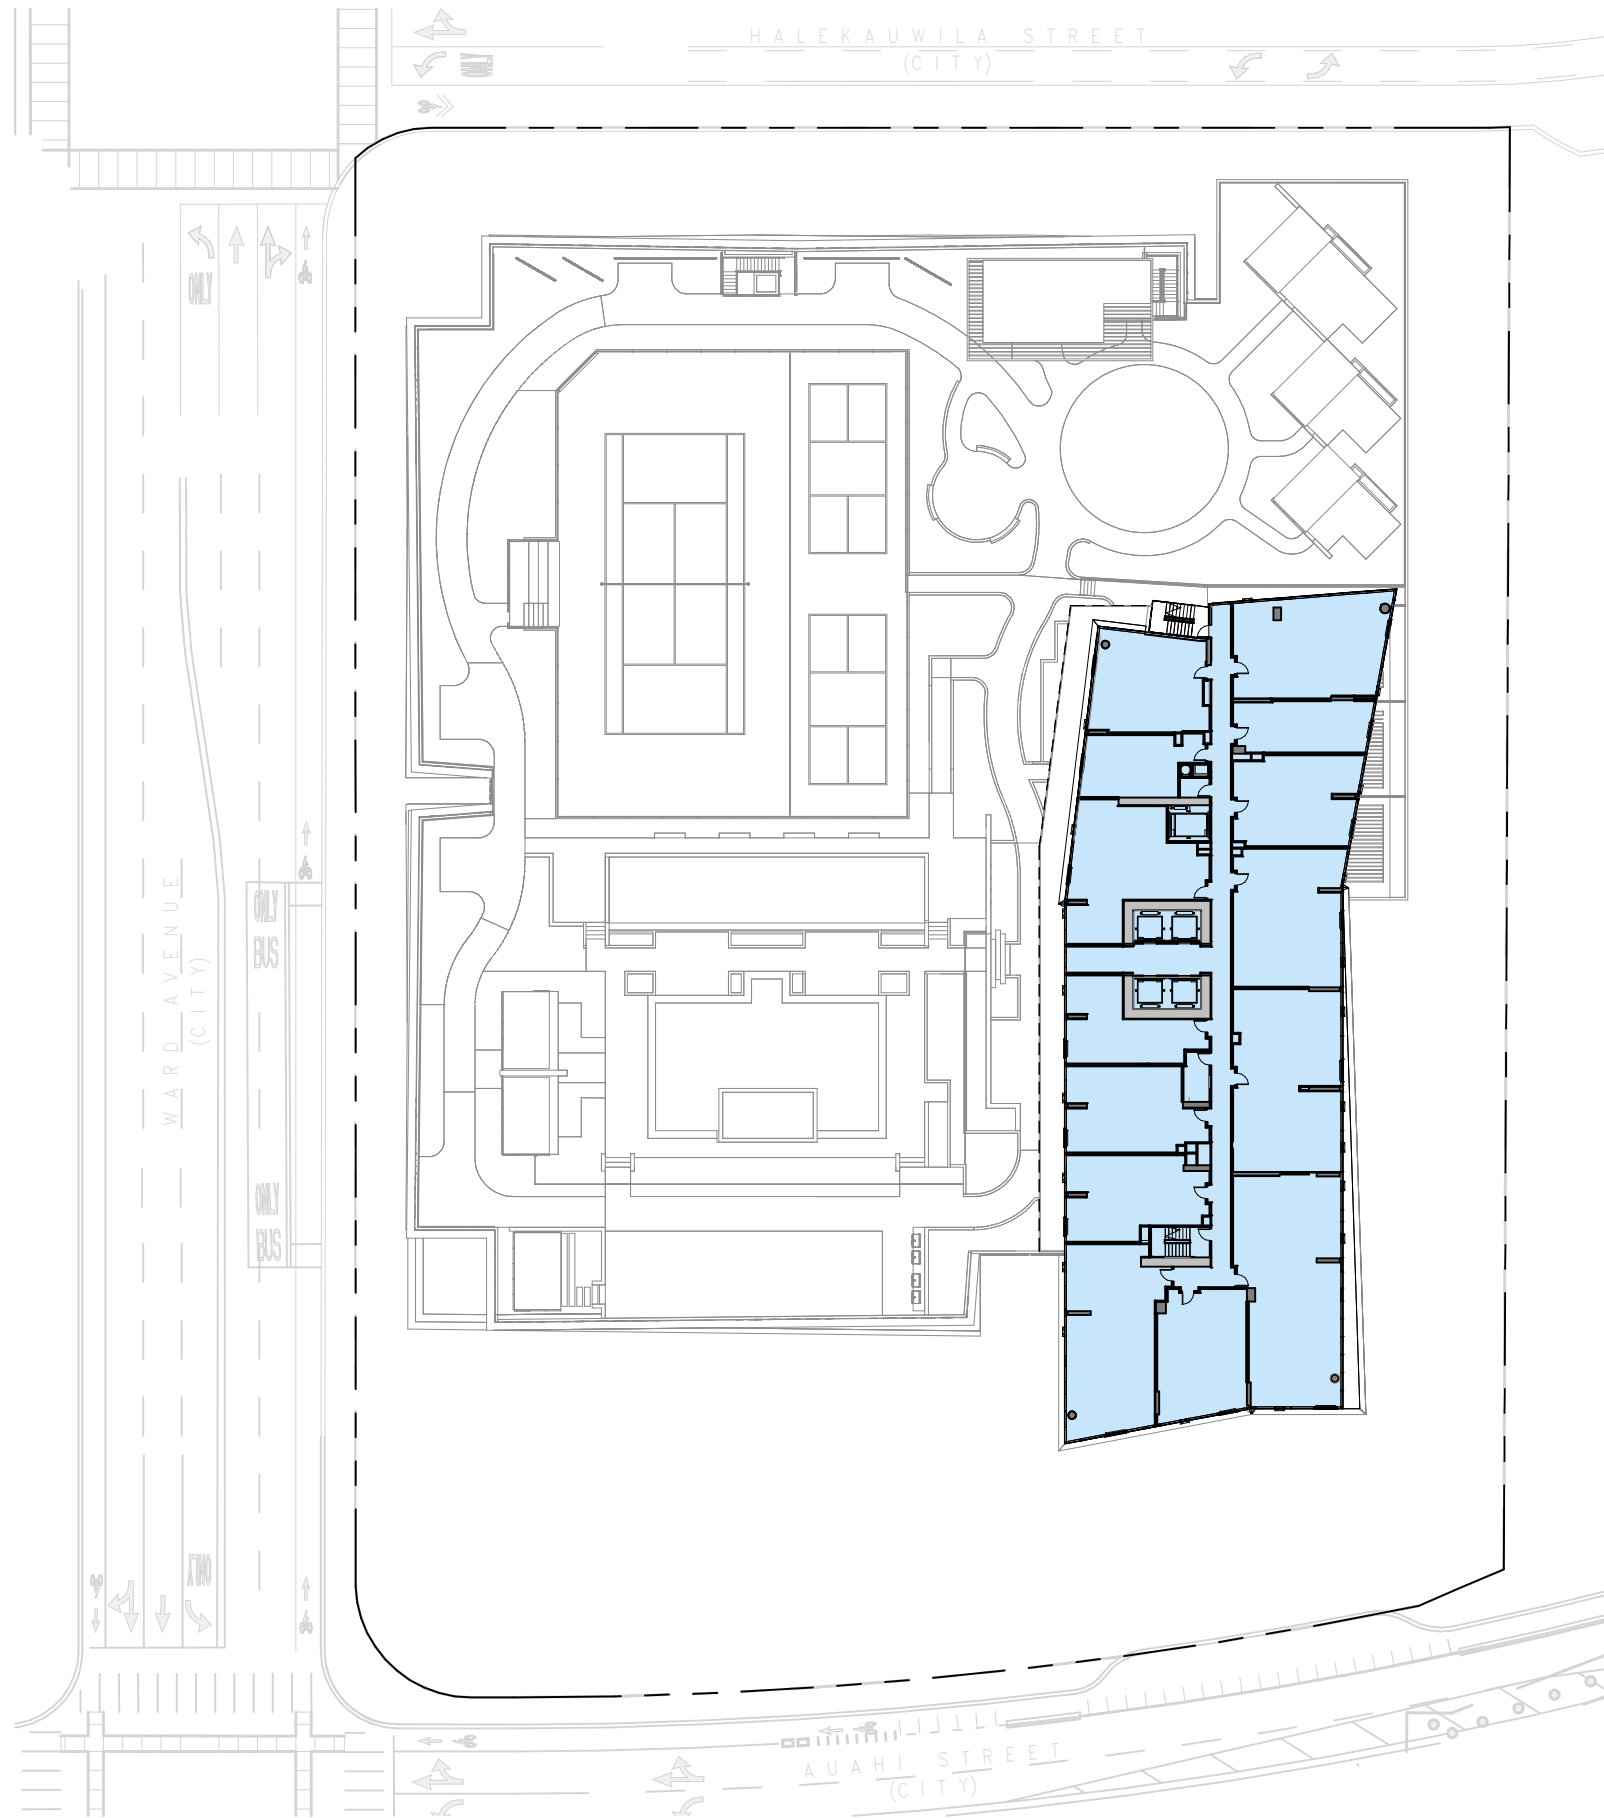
Floor Plan, Levels 9 - 41 (Odd Floors Only)
